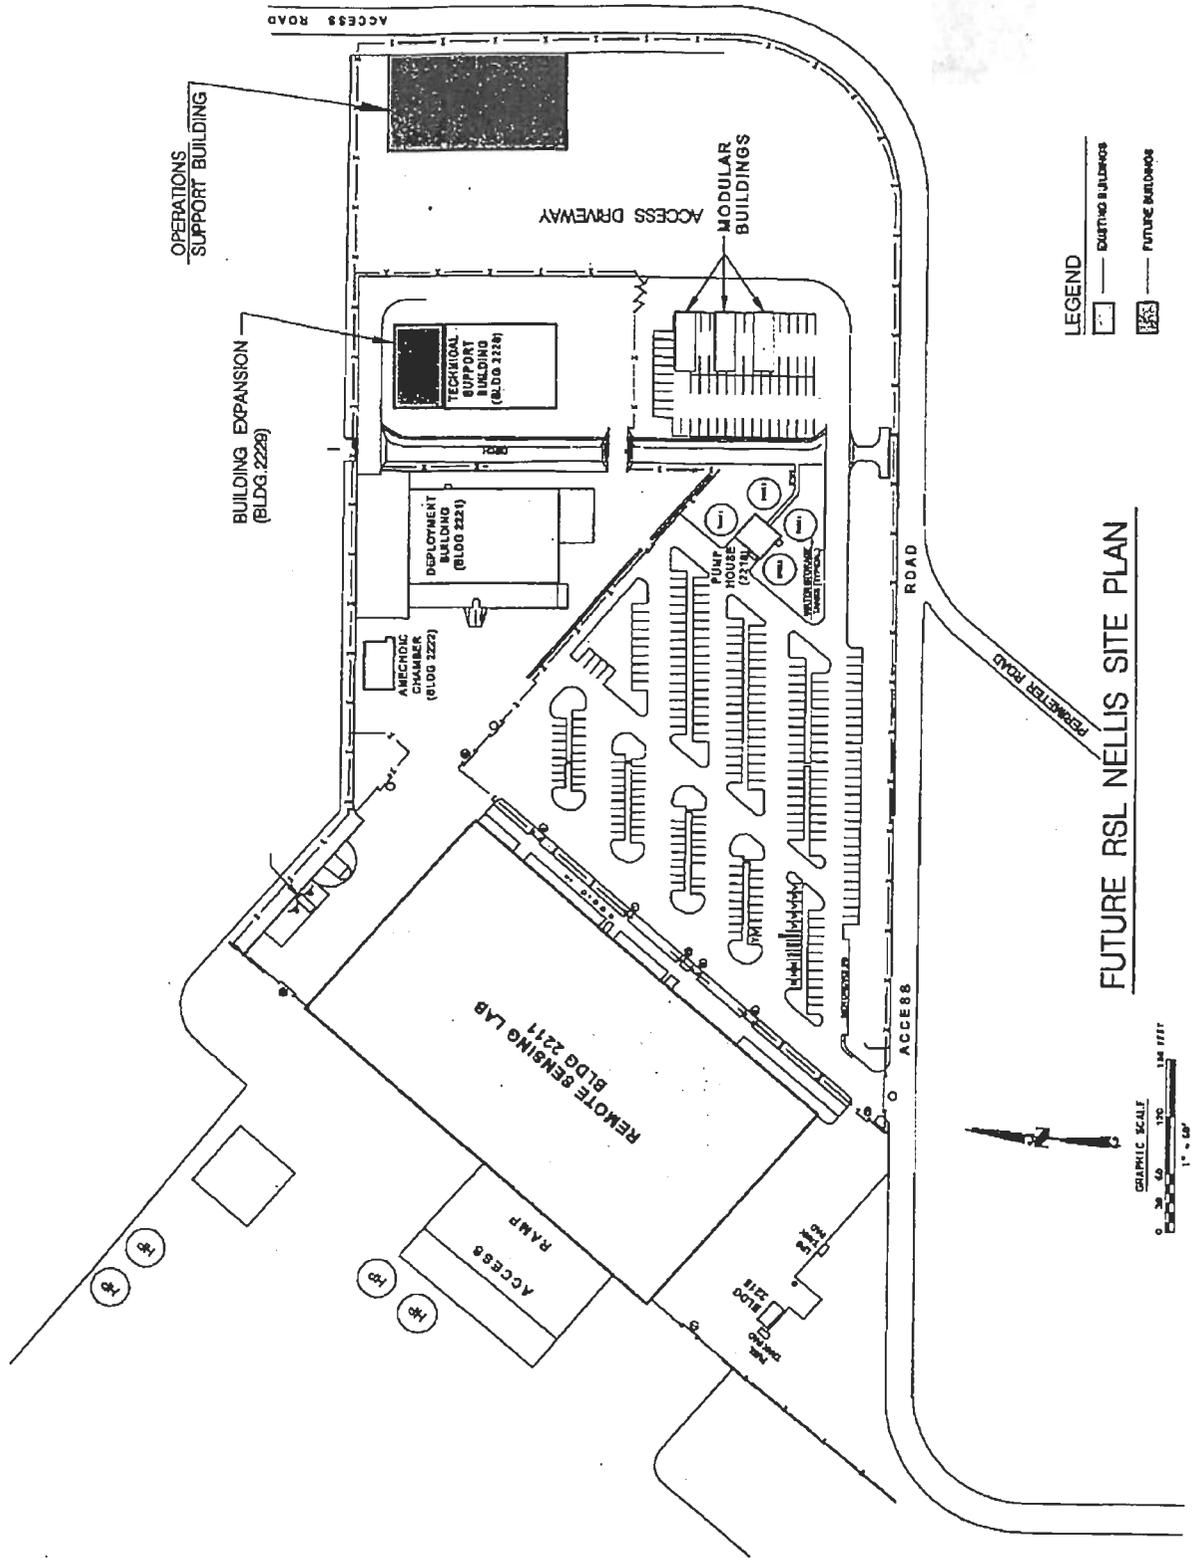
Remote Sensing Laboratory-Nellis Future Site Plan
